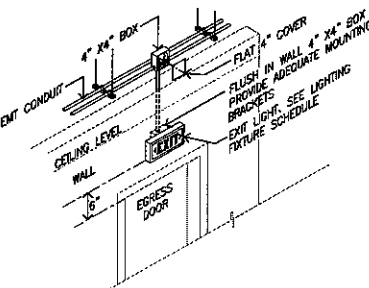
FLUSH IN WALL INSTALLATION N.T.S.
